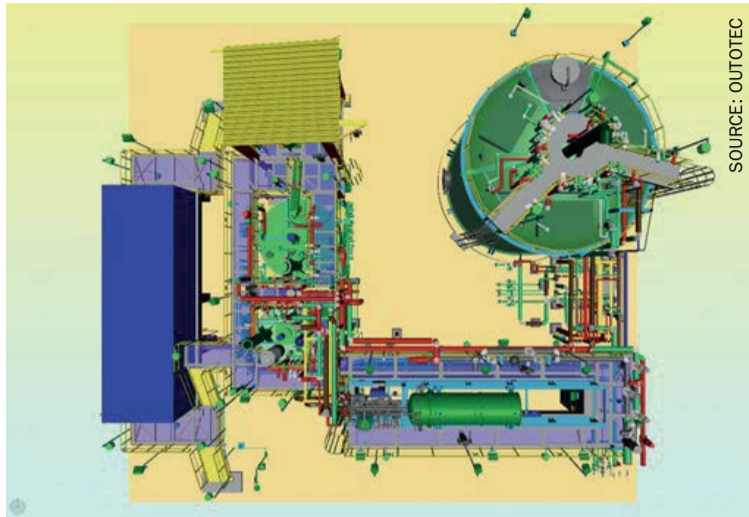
Common melting section for 3 x SAP250M modular acid plants (24 m x 26 m) – plant layout.
